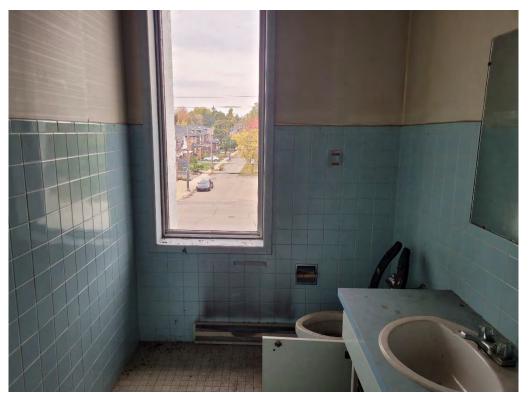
(left) View of open area, looking north, (Source: MHBC, 2023)
